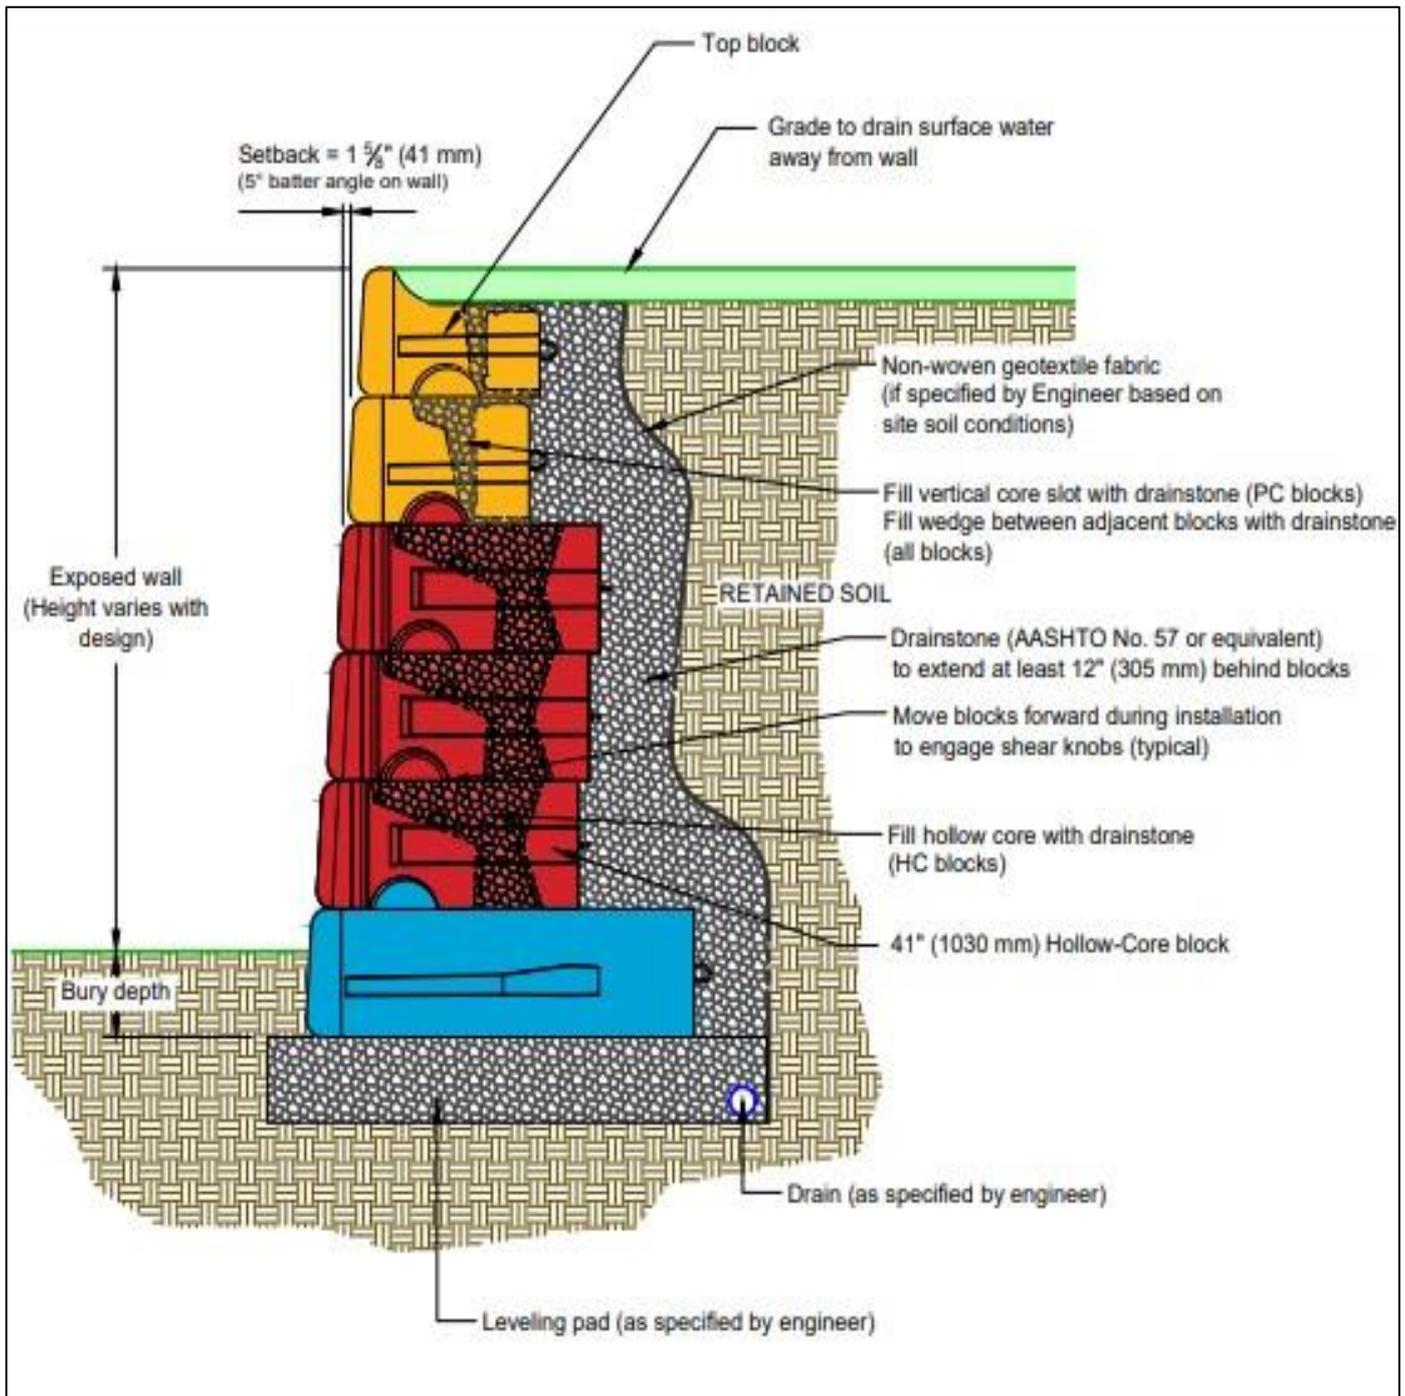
Typical Gravity Wall Detail with Hollow-Core Blocks (Redi-Rock 2020)
